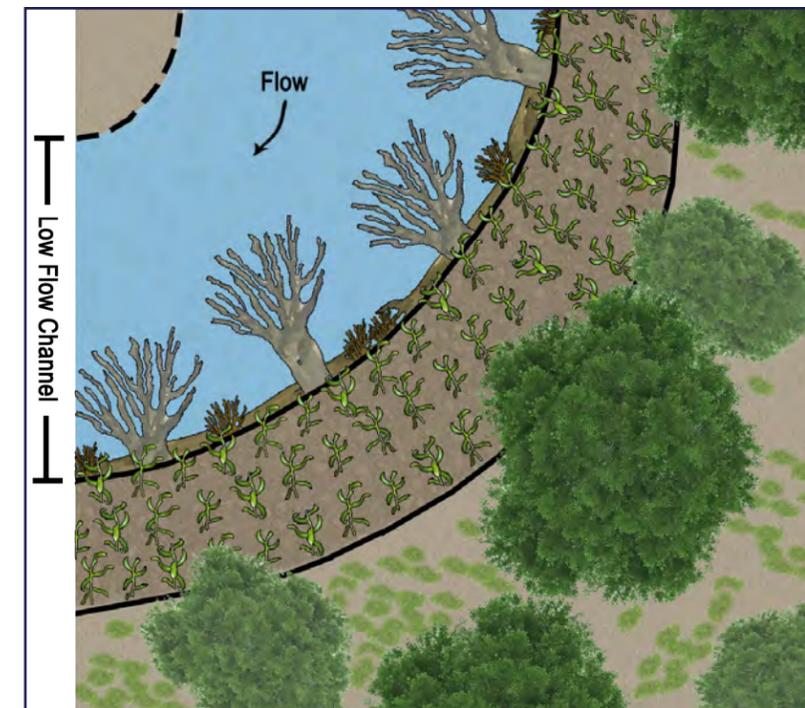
Large Woody Debris Bank Protection Plan View
